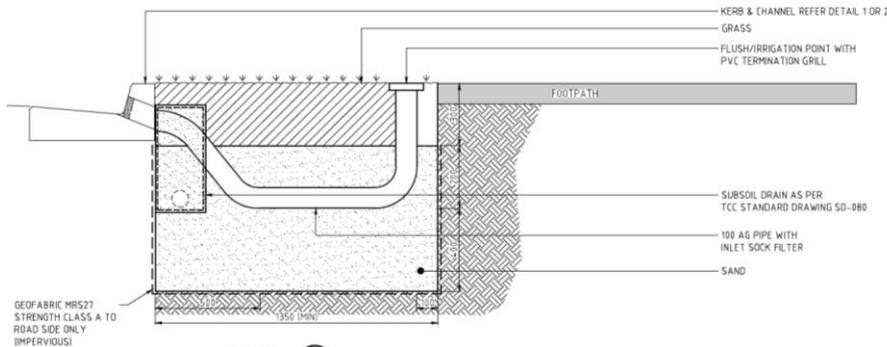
Minor Retrofit WSST scenario illustrating kerb cut and ag pipe for water distribution. An impervious liner protects the pavement infrastructure.
